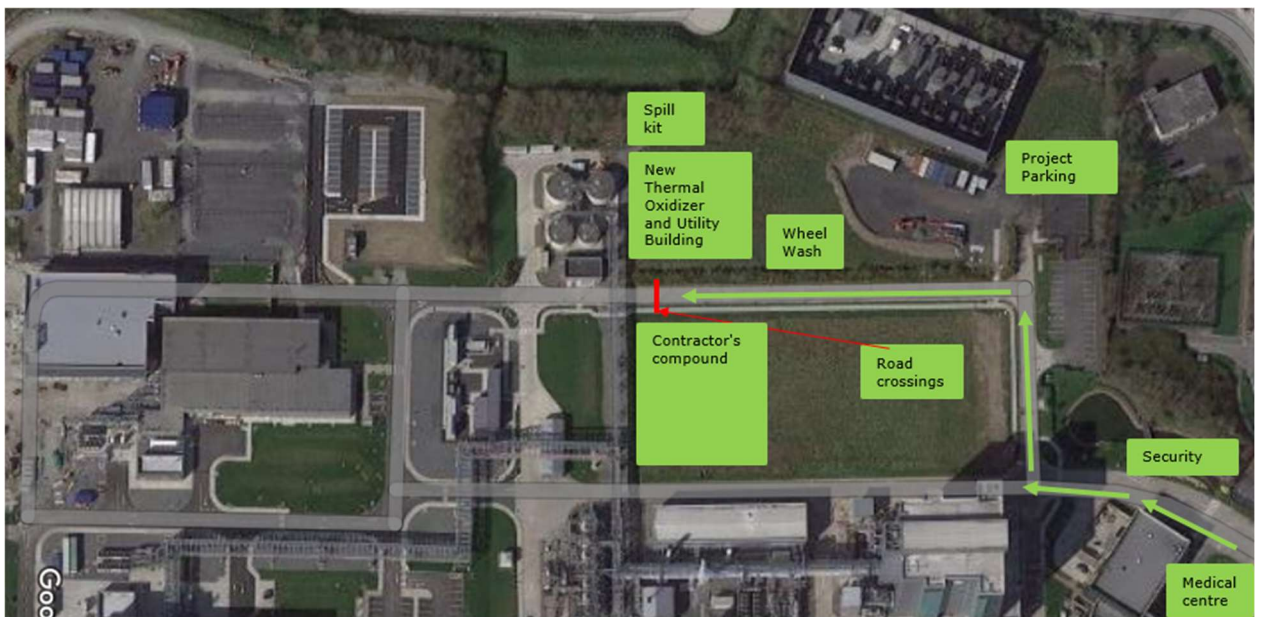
Site Plan of Construction Zone including Piperack, Thermal Oxidiser, Utility Building, project car park, temporary laydown area and contractors compound.
